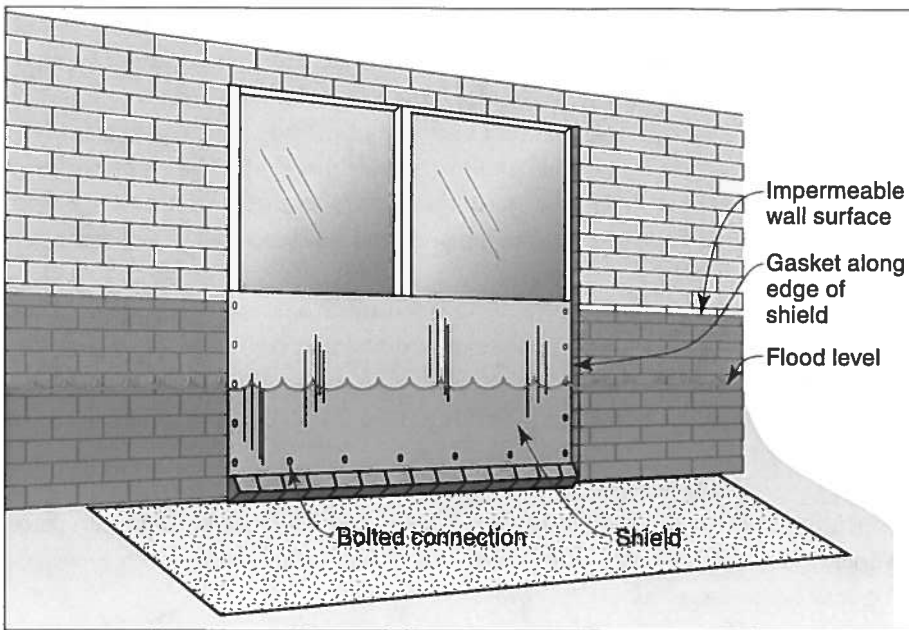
Window protected from low-level flooding by a flood shield and wall sealant
